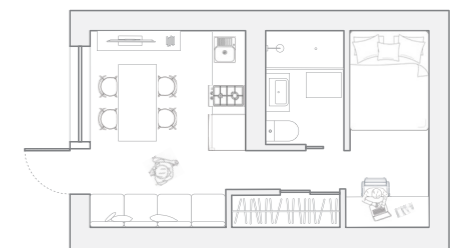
Compilation of Tiny House Floor Plans (Scale 1:200)
